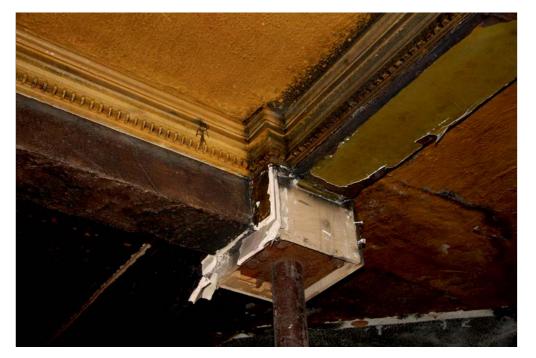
Detail of dentil patterned cornice between rooms 1.4 and 1.5
